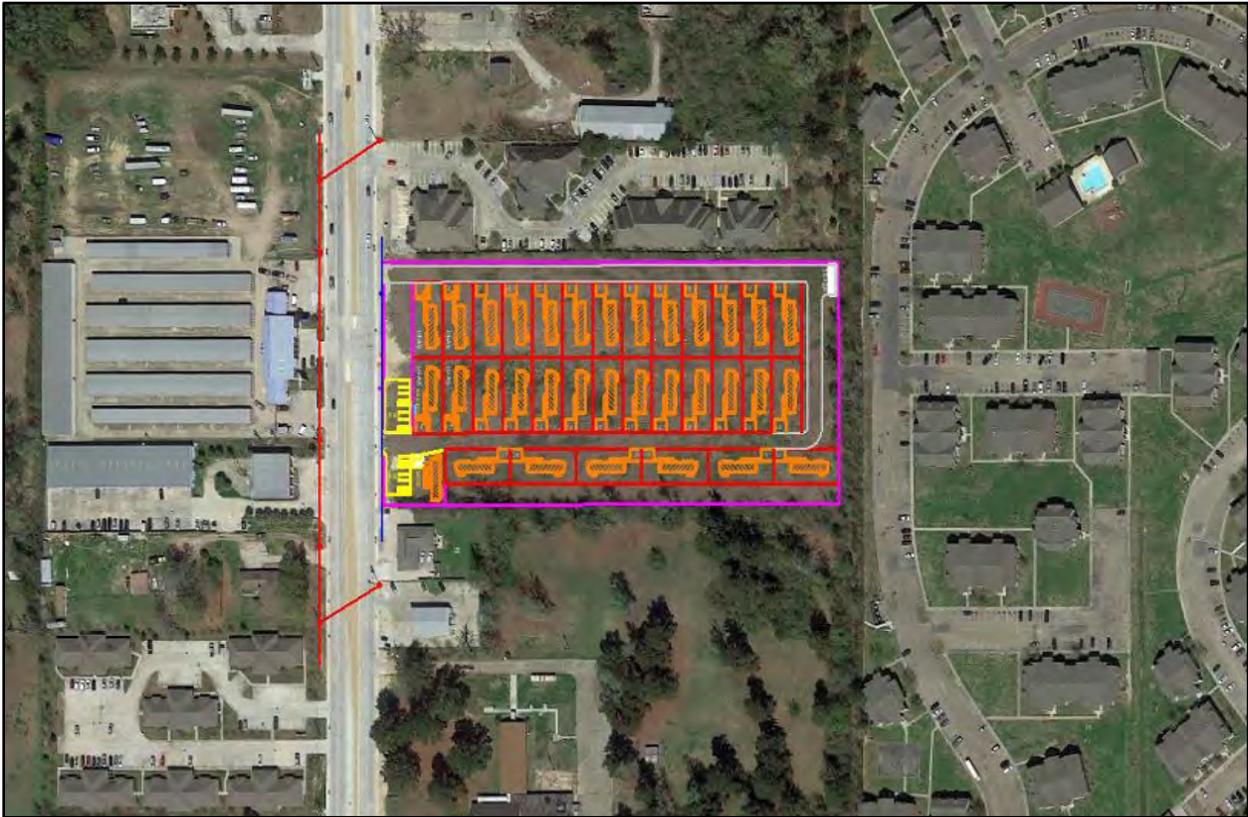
Existing Conditions on Proposed O'Neal Group Site
